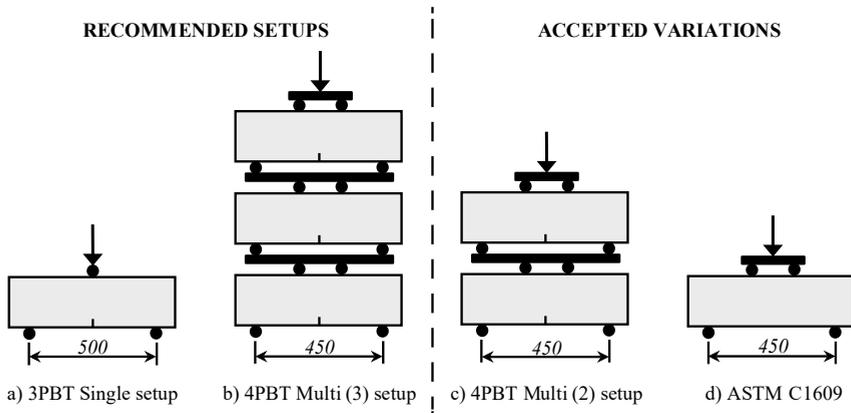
Recommended and accepted single- and multi-specimen creep test setups.
